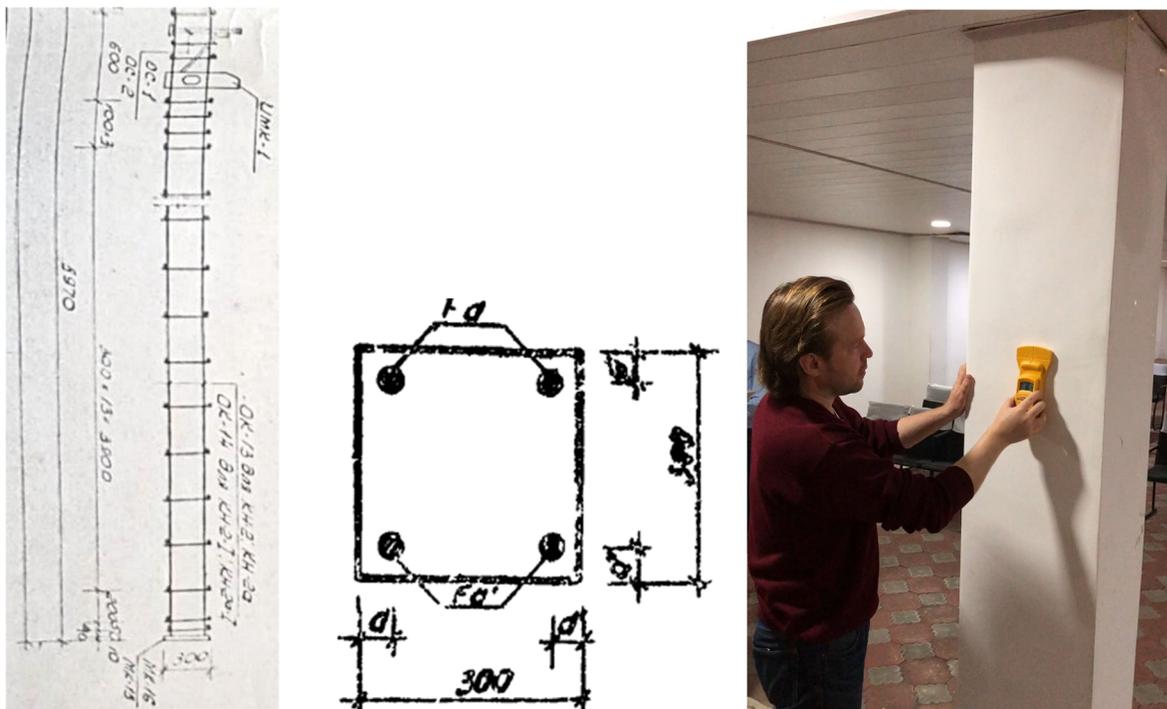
Column stirrup spacing indicating coarse tie spacing: on the left and middle, sample column drawings from a precast frame series (Series II-4), similar to index buildings; on right, investigation with metal detector.
